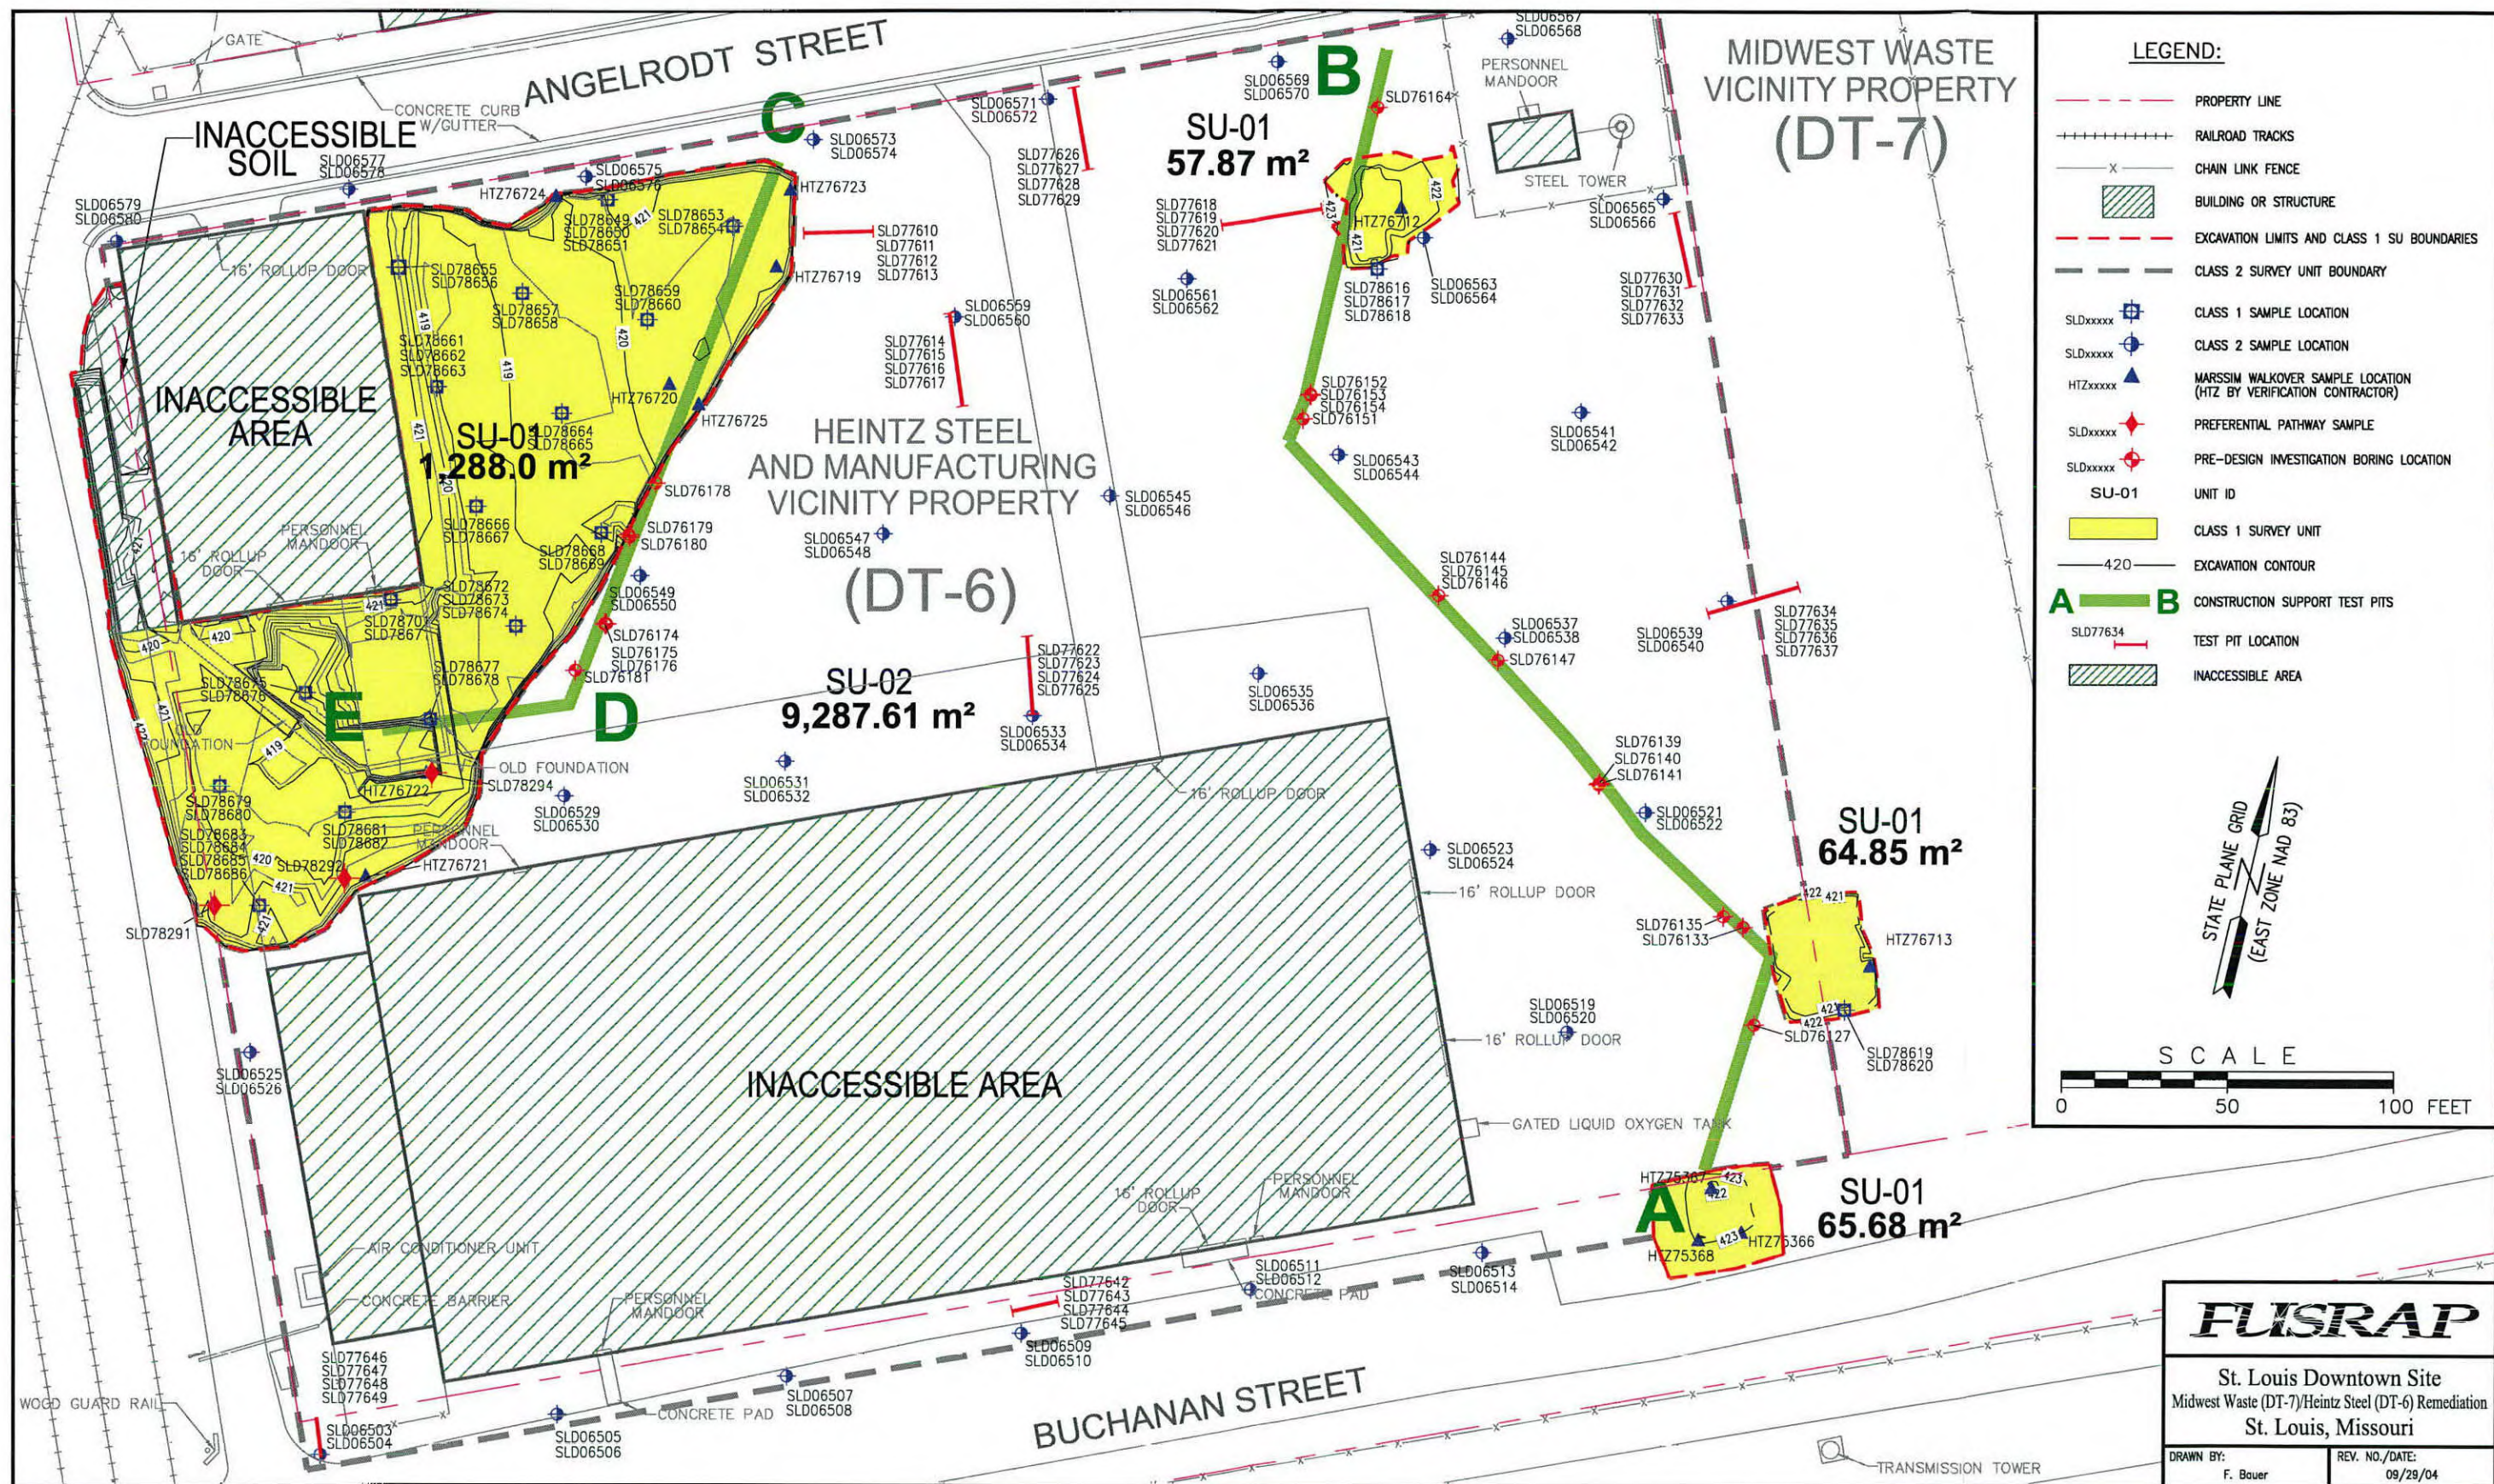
As Built Excavation Areas and Survey Units, DT-6
